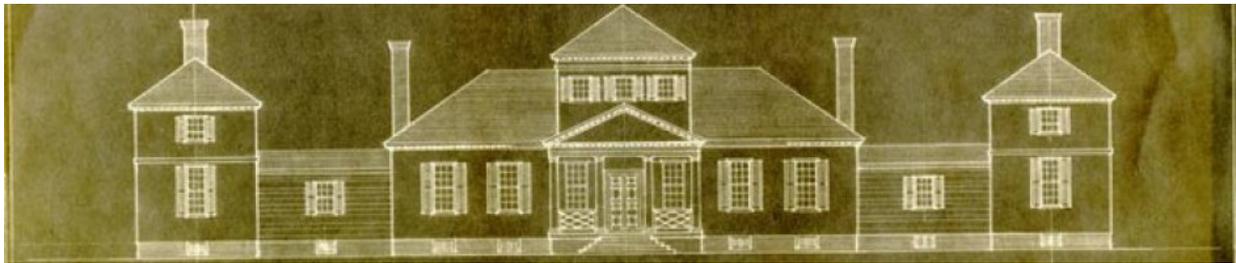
Tazewell Hall Original Elevation. (Source: skinnerfamilypapers.com).
